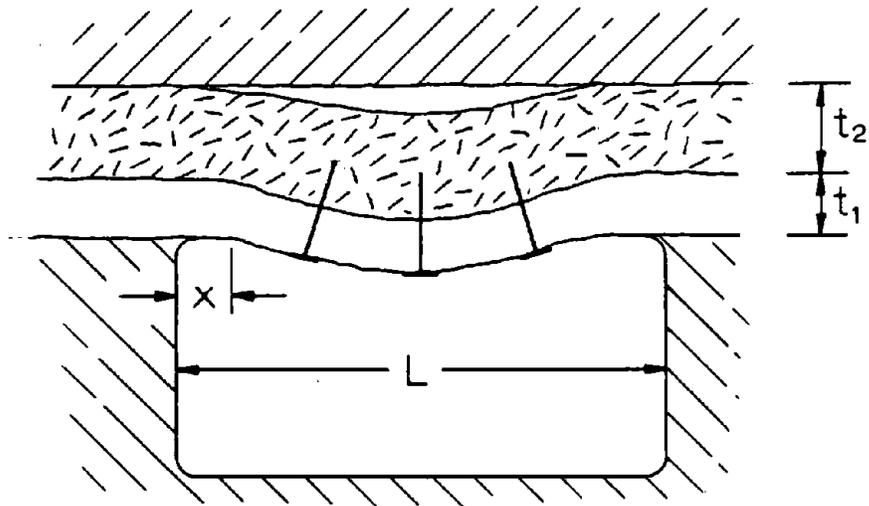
Gravity Loading of Multiple Roof Beams with Built-In Ends [2.47]
